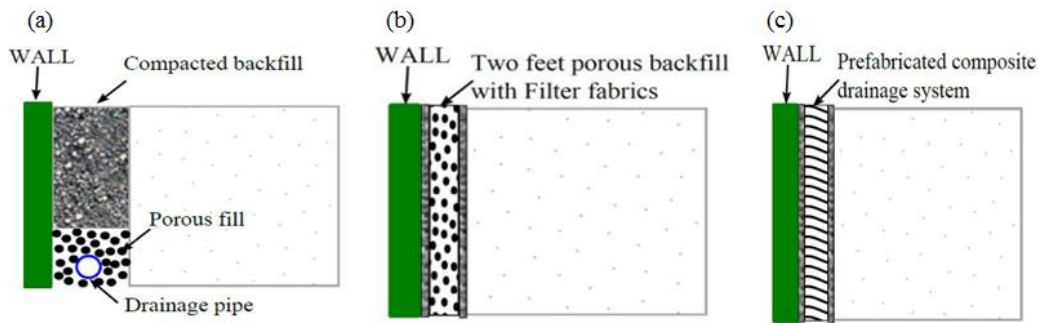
Different drainage methods: (a) porous backfill around drainage pipe, (b) porous backfill with geotextile, (c) geocomposite drainage system [5]
